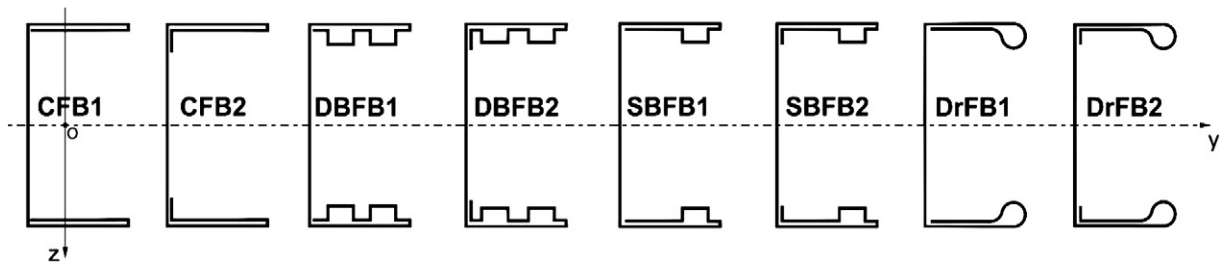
Scheme of the cross-sections of the beams with non-standard flanges.
